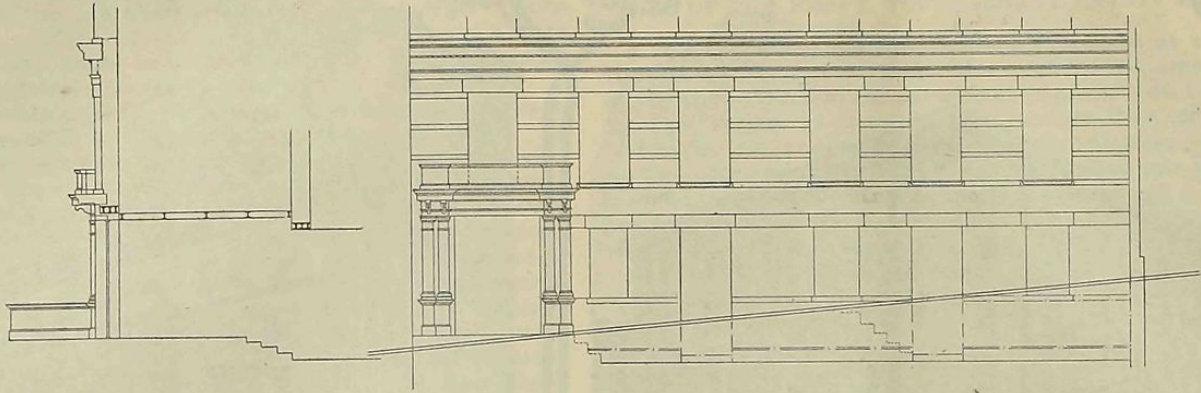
An ingenious design to take advantage of grade of street, securing entrances and halls, etc., in basement.
